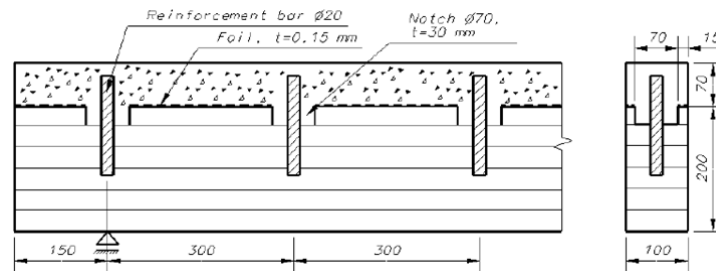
timber-concrete connection with grooved holes and dowels (after Van der Linden 1999) (dimensions in mm)
